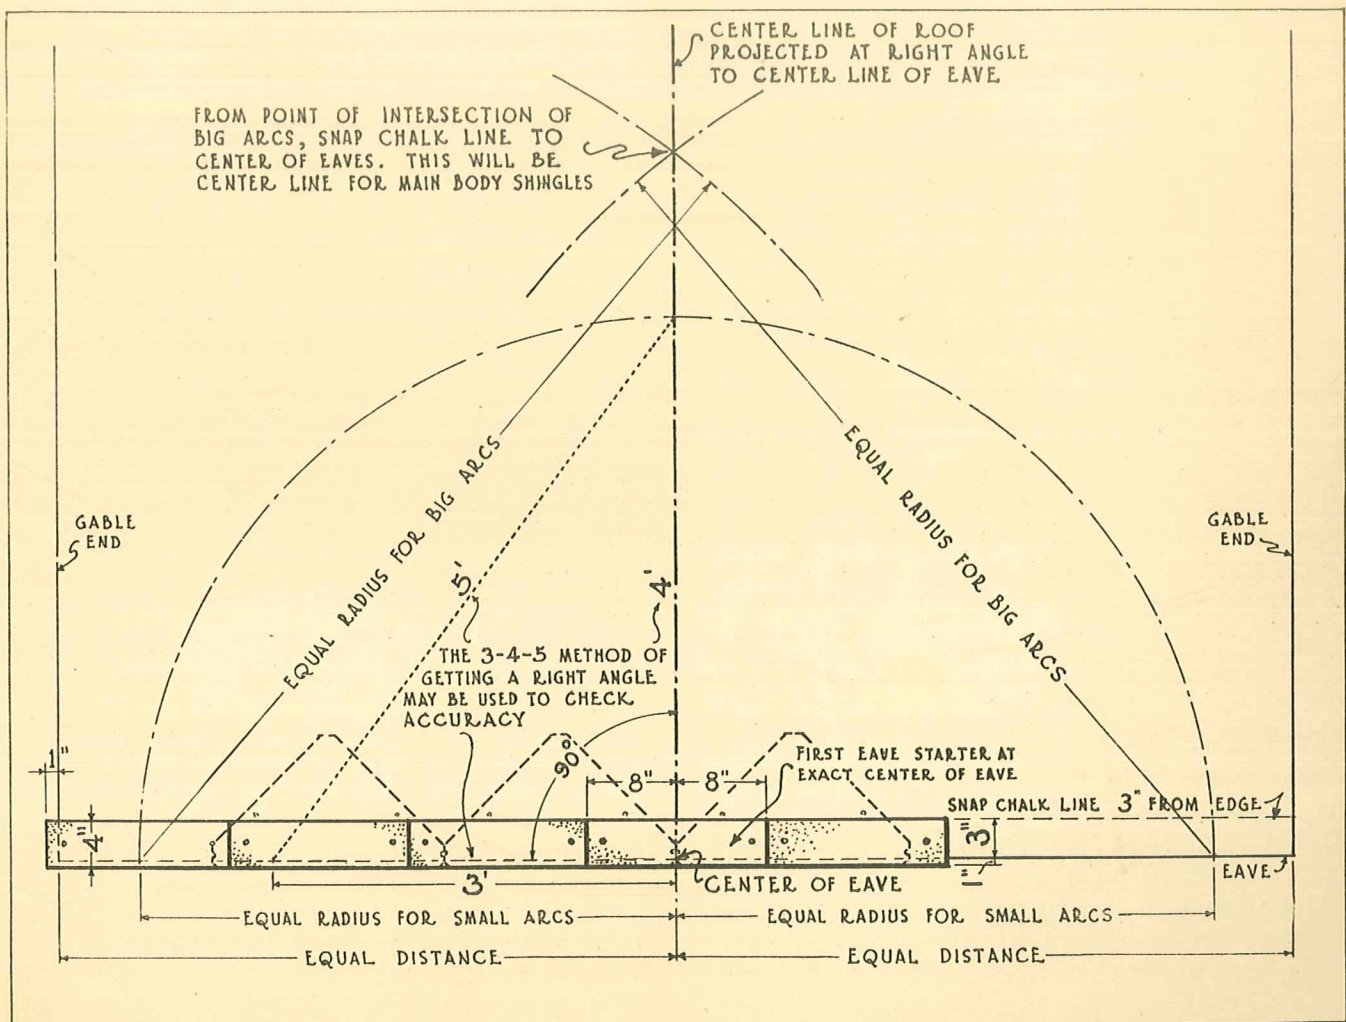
Method of locating center line and applying eaves starters in laying Hexagonal Shingles
